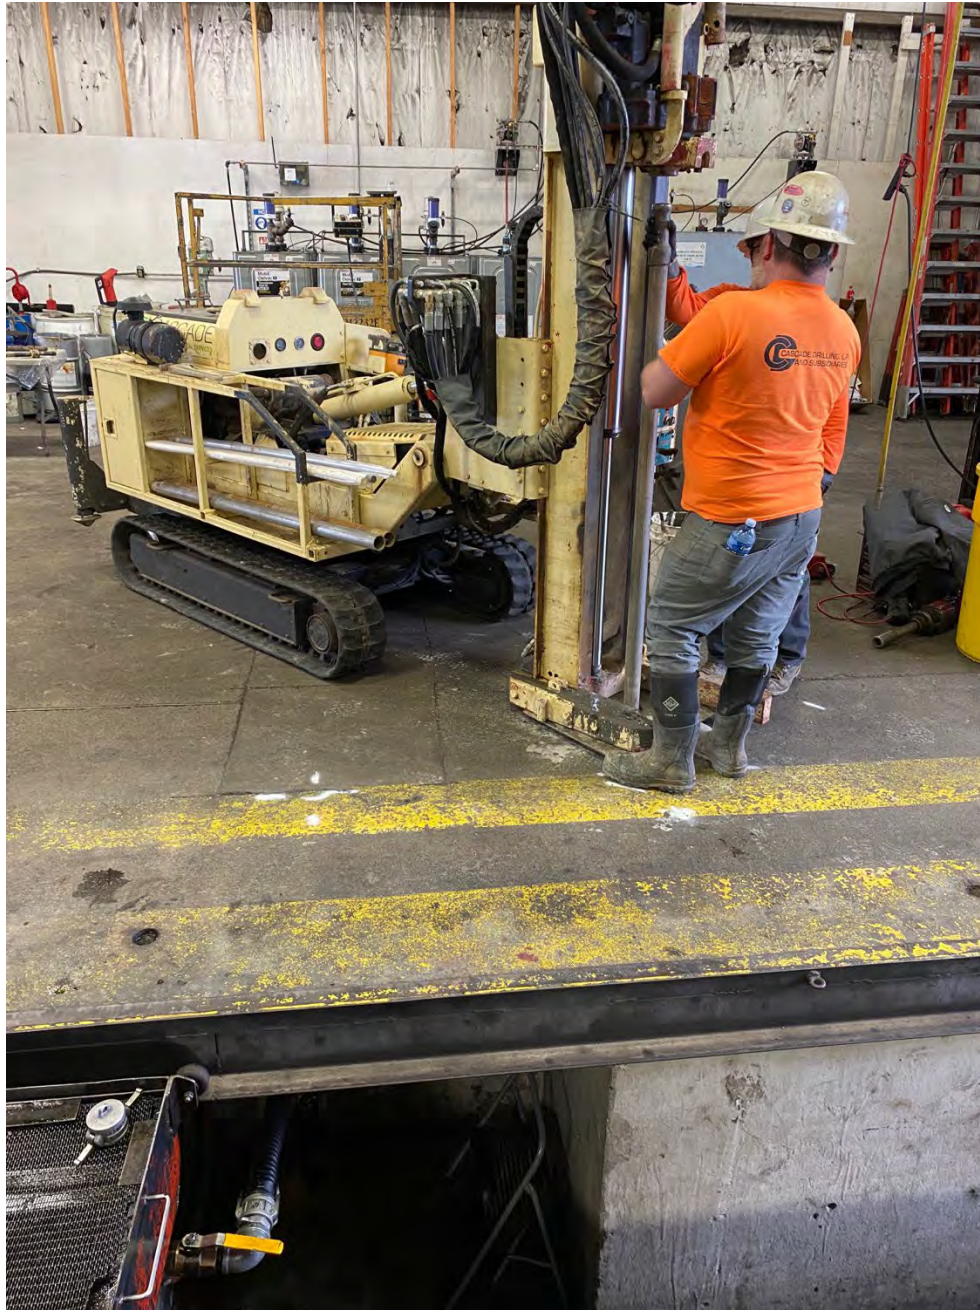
View north of drilling at the Boring B-15 location adjacent to the east alcove of the mechanic pit. Note oil drain pan and hose connection (lower left) to piping that transfers waste oil to a tank located at the fueling center (on the opposite side of the wall in the background). Note the concrete patch leading from the east alcove to the wall, covering the waste oil pipe trench; the drill rig is sitting directly over the concrete patch.
